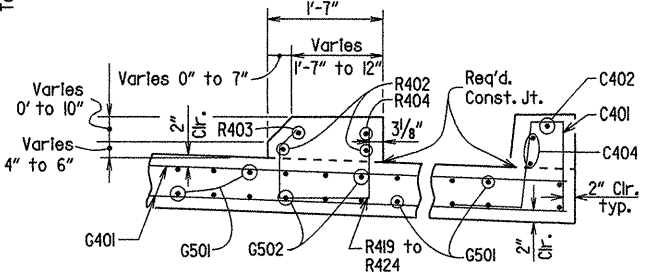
DETAILS OF TYPE SPECIAL APPROACH GUTTER
